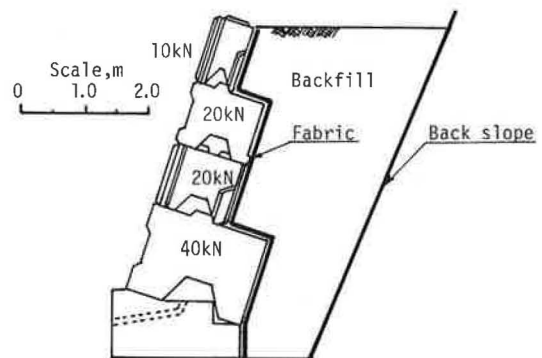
Large concrete block retaining wall with fabric sheet backside.
